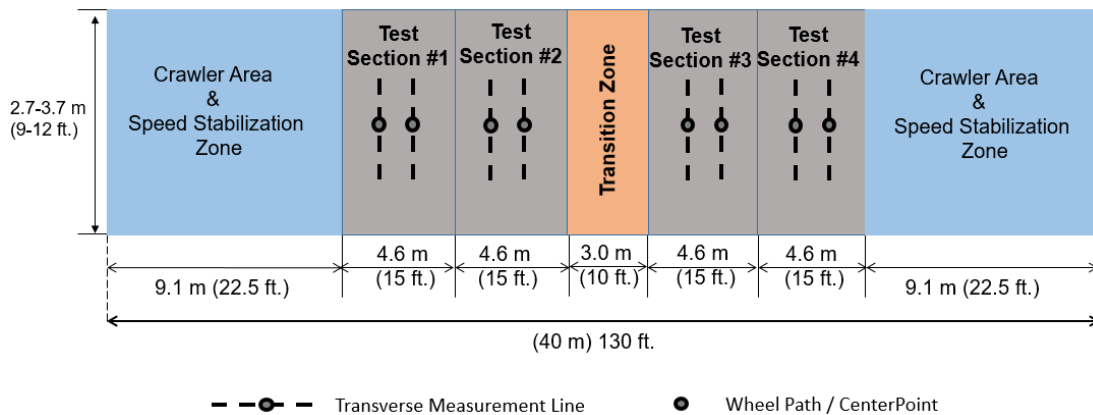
Plan view of a typical test cell showing the transition zones, buffer zones and the measurement lines
